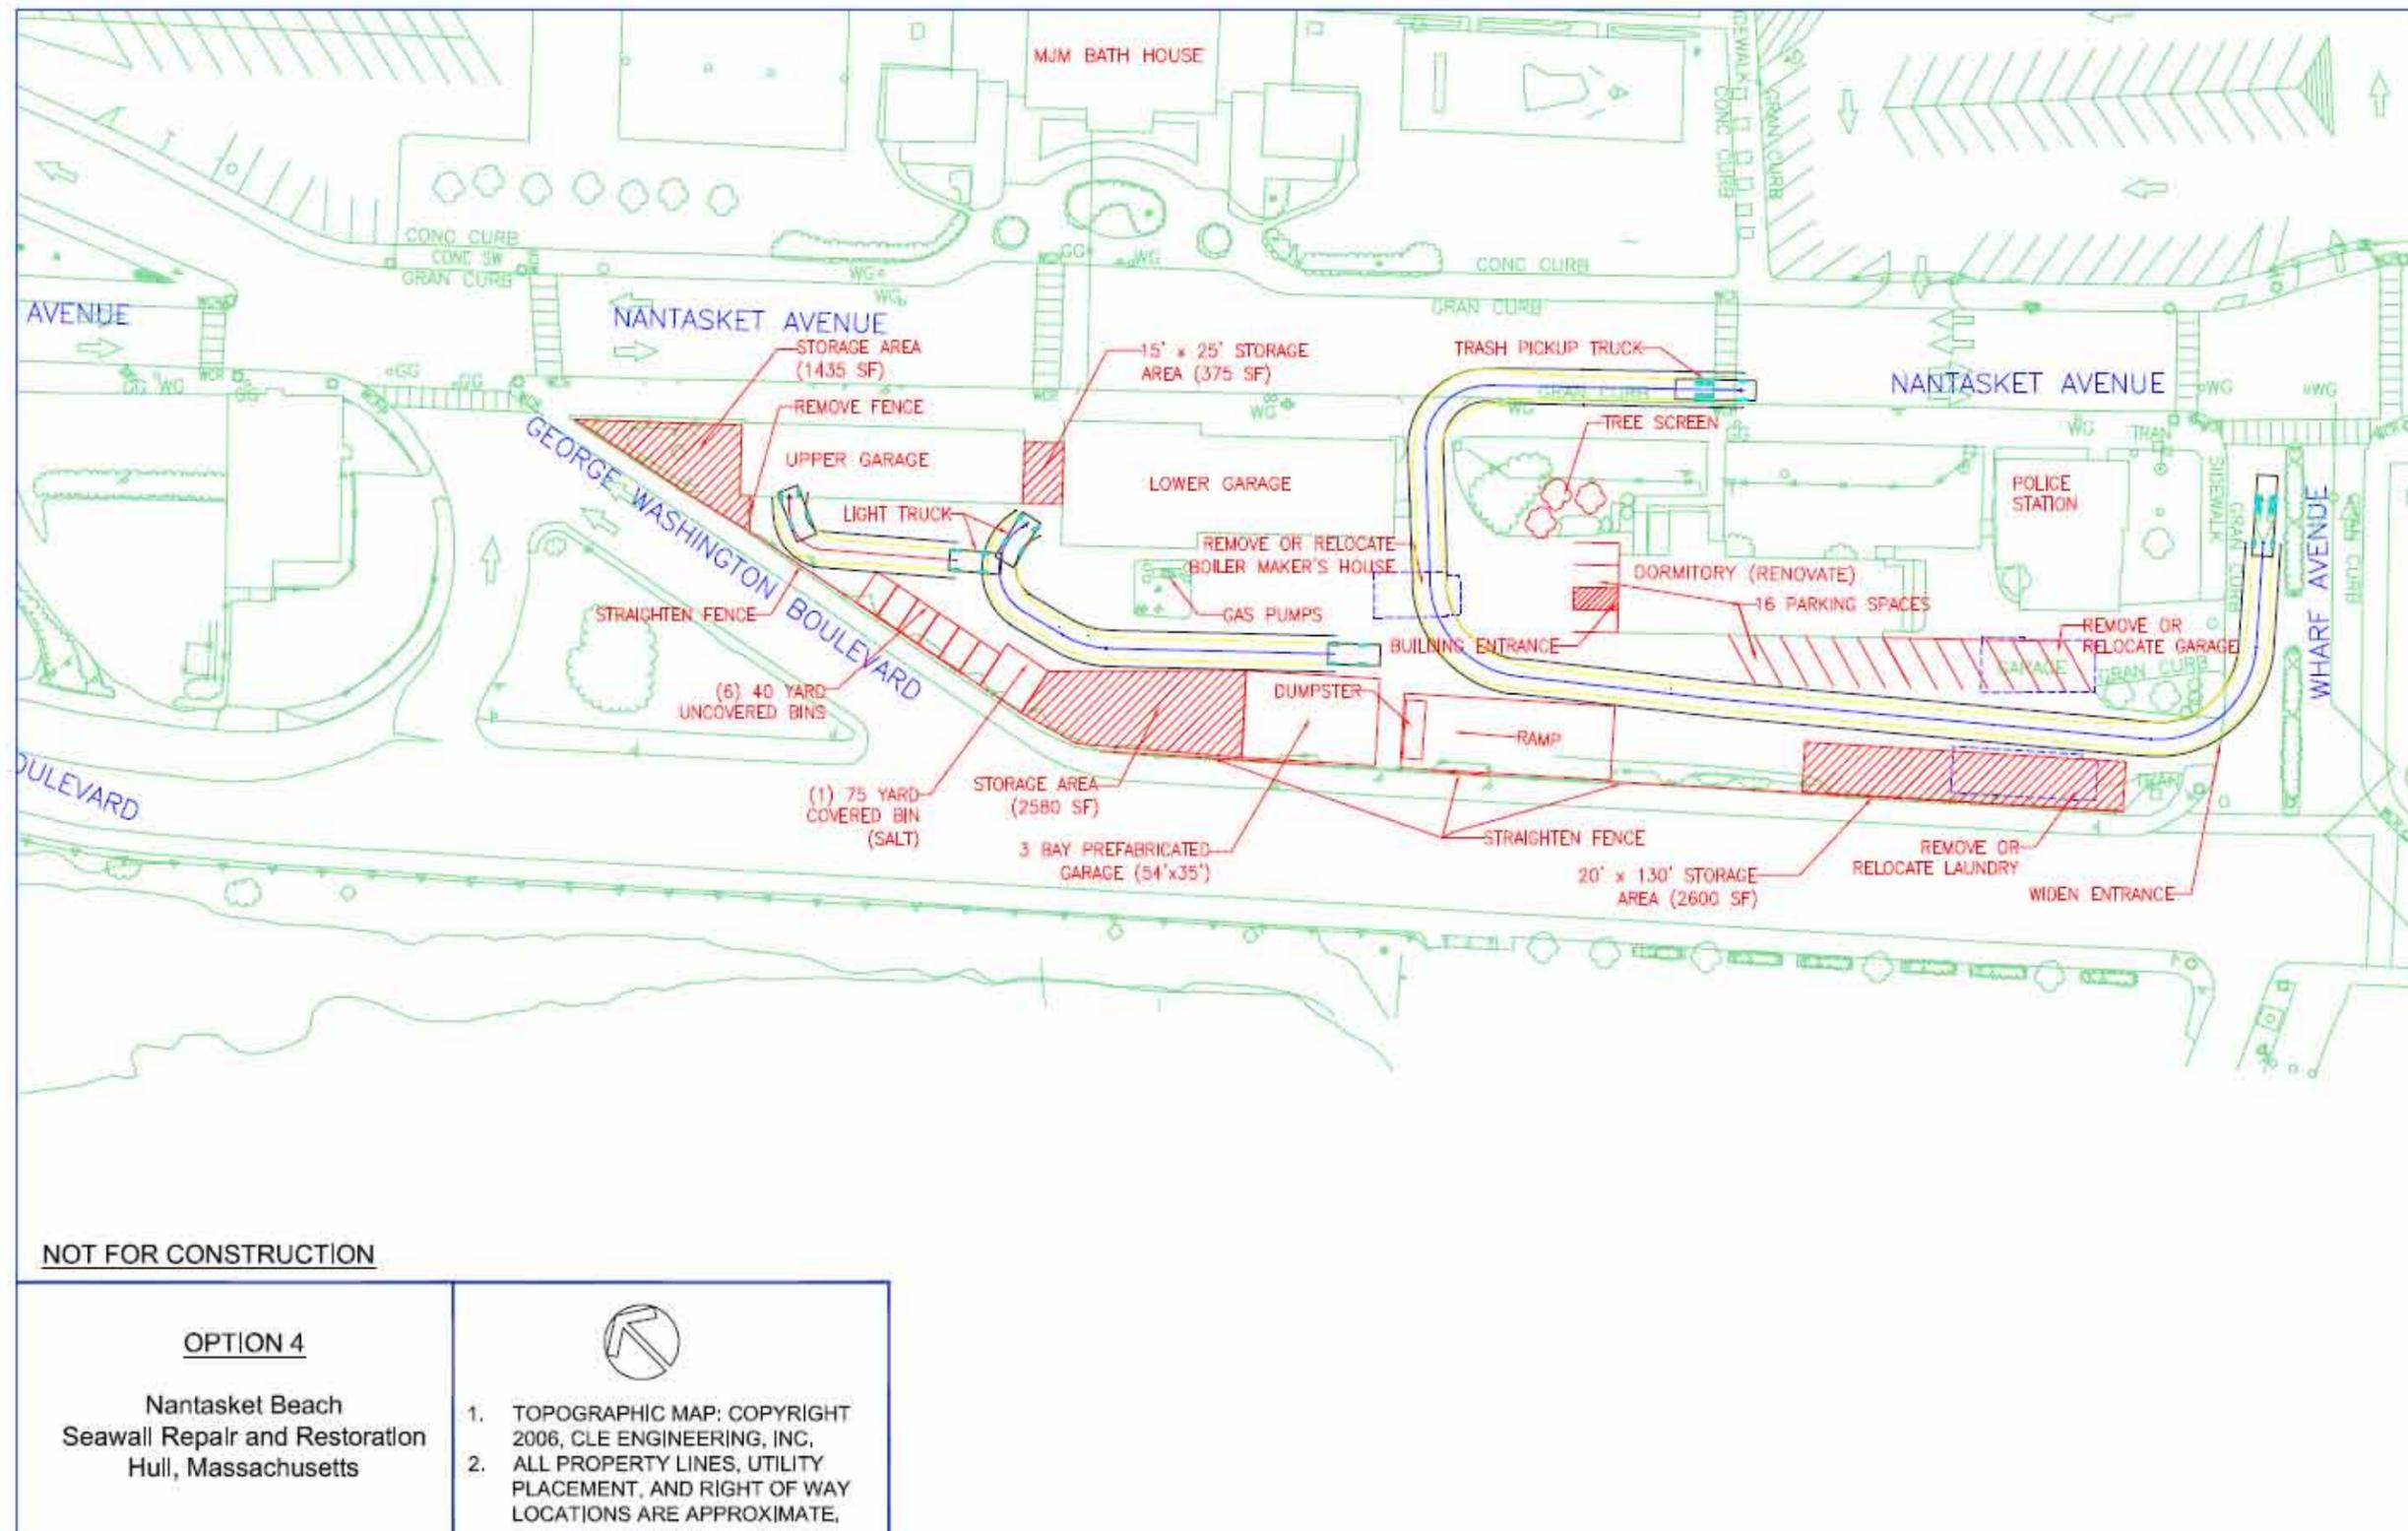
Facilities Layout Option 4 under Traffic Alternative A
